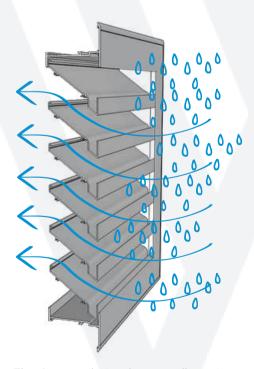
ventilation louvres allow air to enter and exit the building whilst minimising the entry of wind driven rain.
